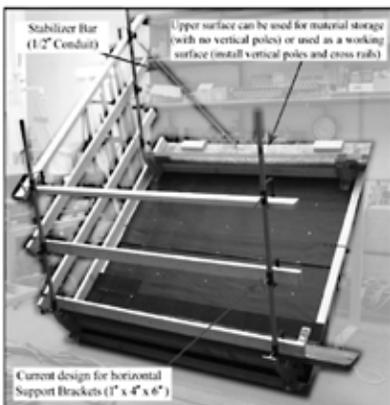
Lab set-up to show 3-sided protection for chimney or dormer work (3rd side not in place yet)
